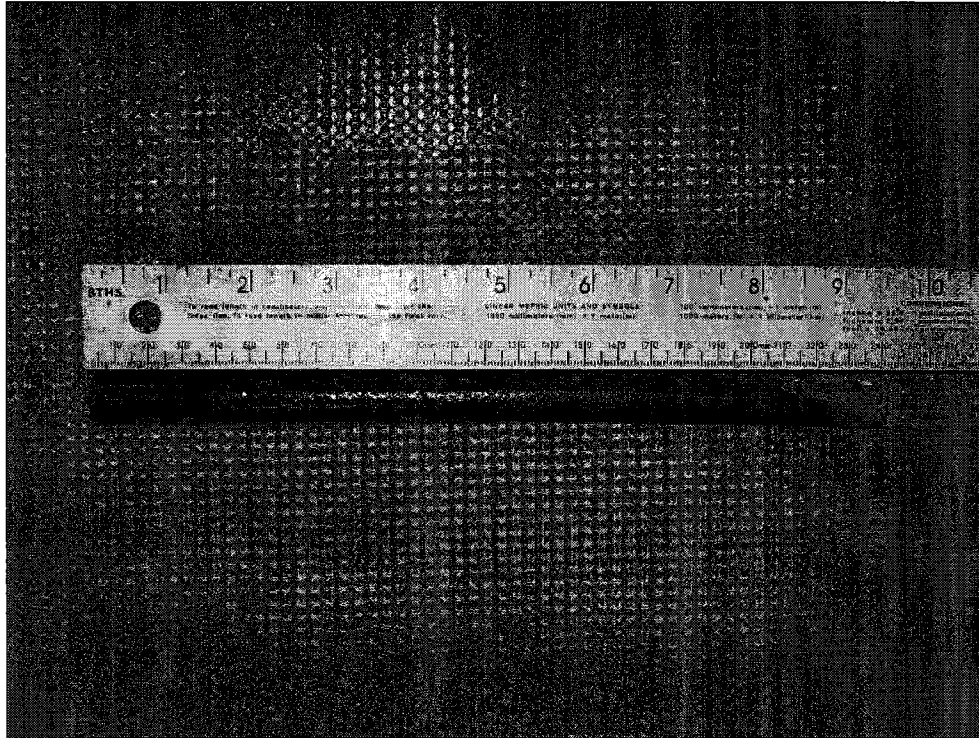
Rebar Sample S3 (East Abutment, 15M, vertical)
